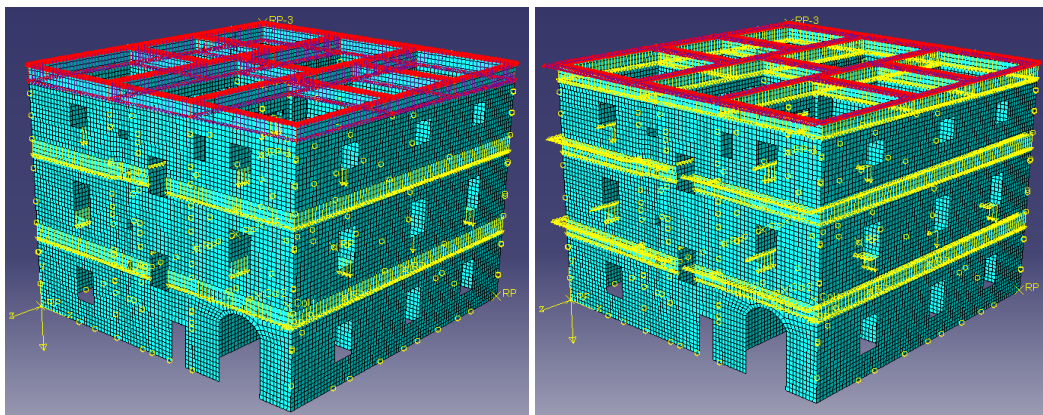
Floor free model loaded with (a) vertical load and (b) horizontal load on the top floor.
